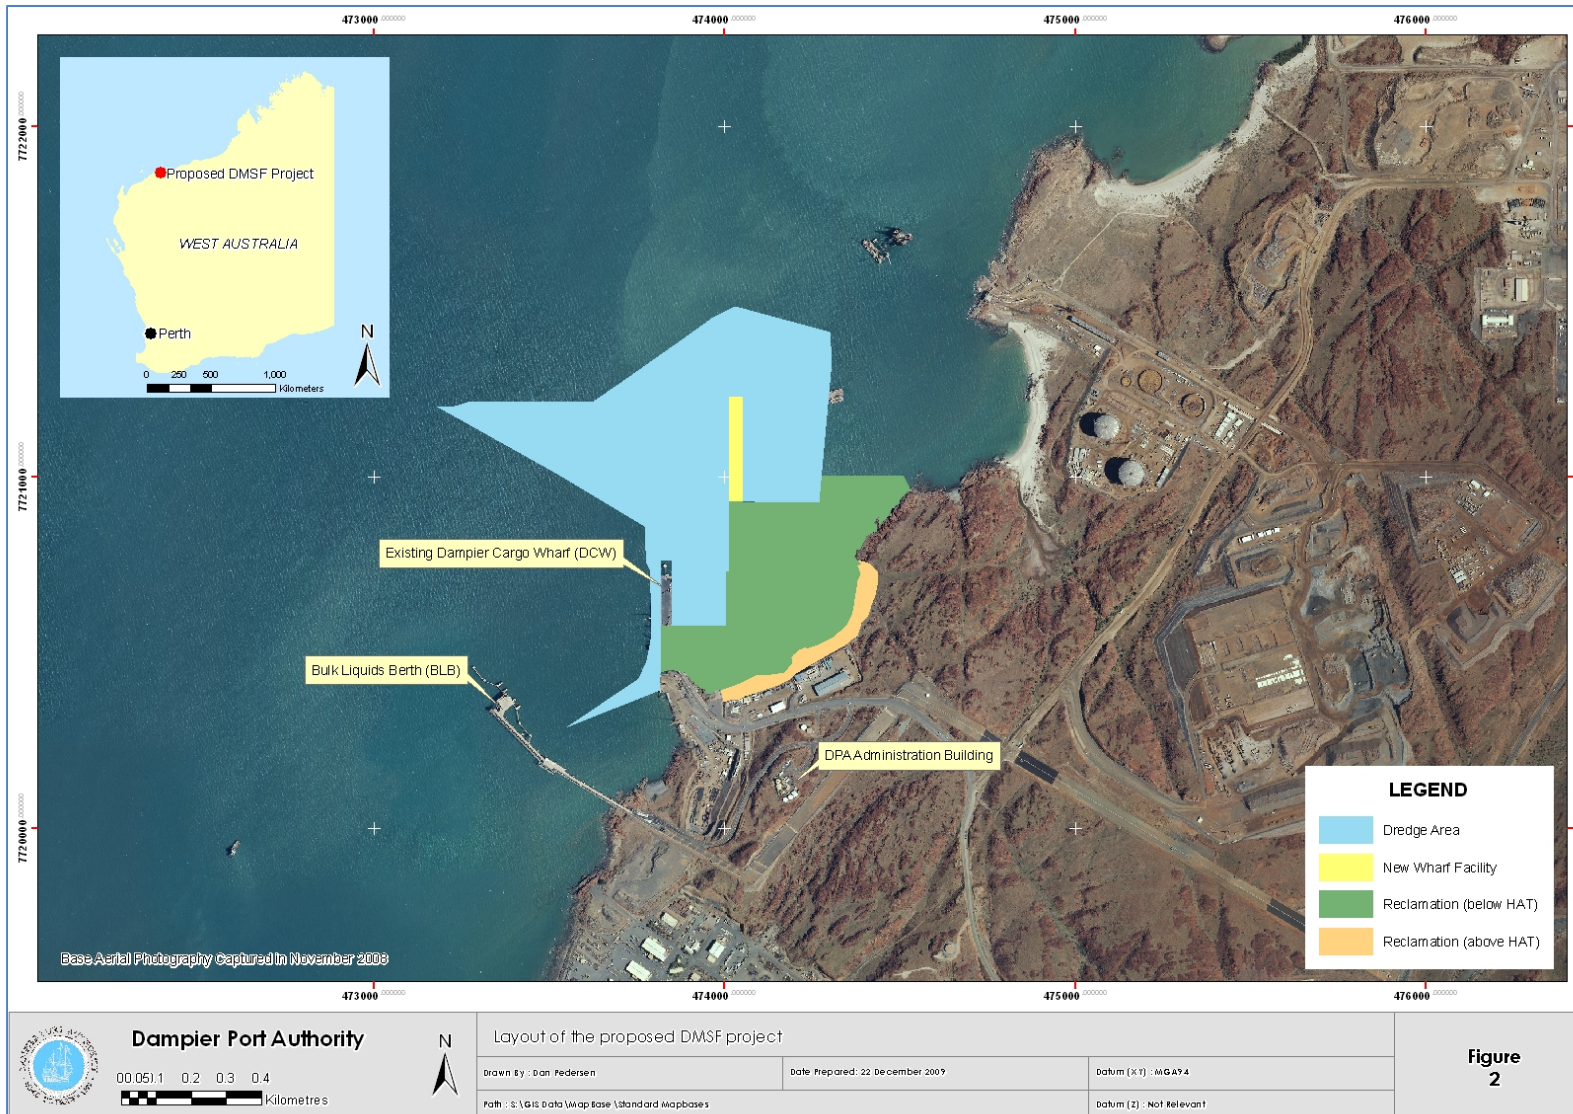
Layout of the DMSF Project (Dampier Port Authority, 2009).
